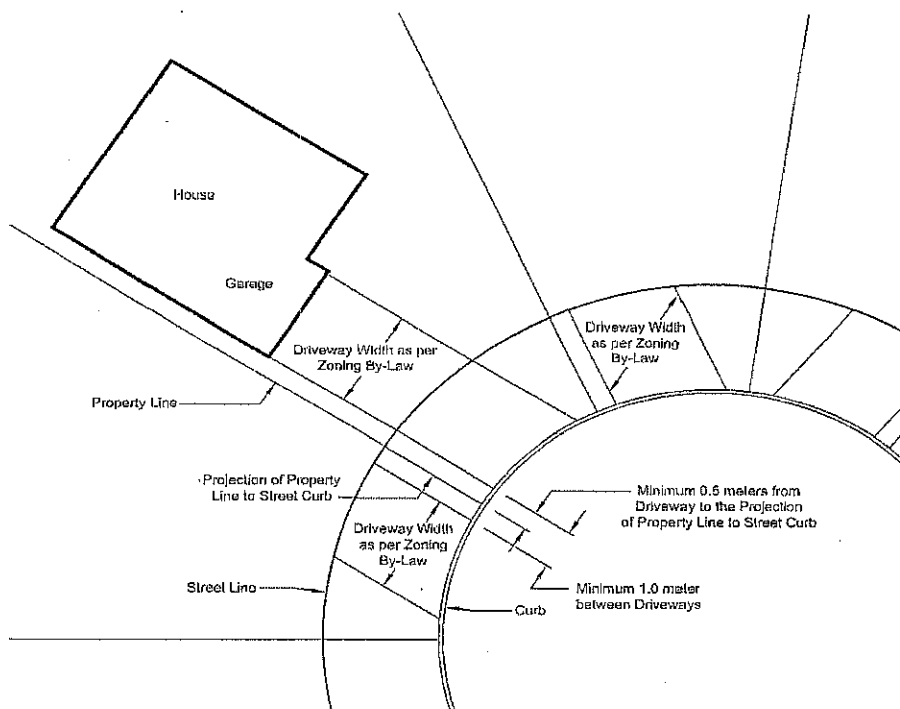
Minimum spacing between driveways at the Street Curb – Curve or Angle Bend in the Street
